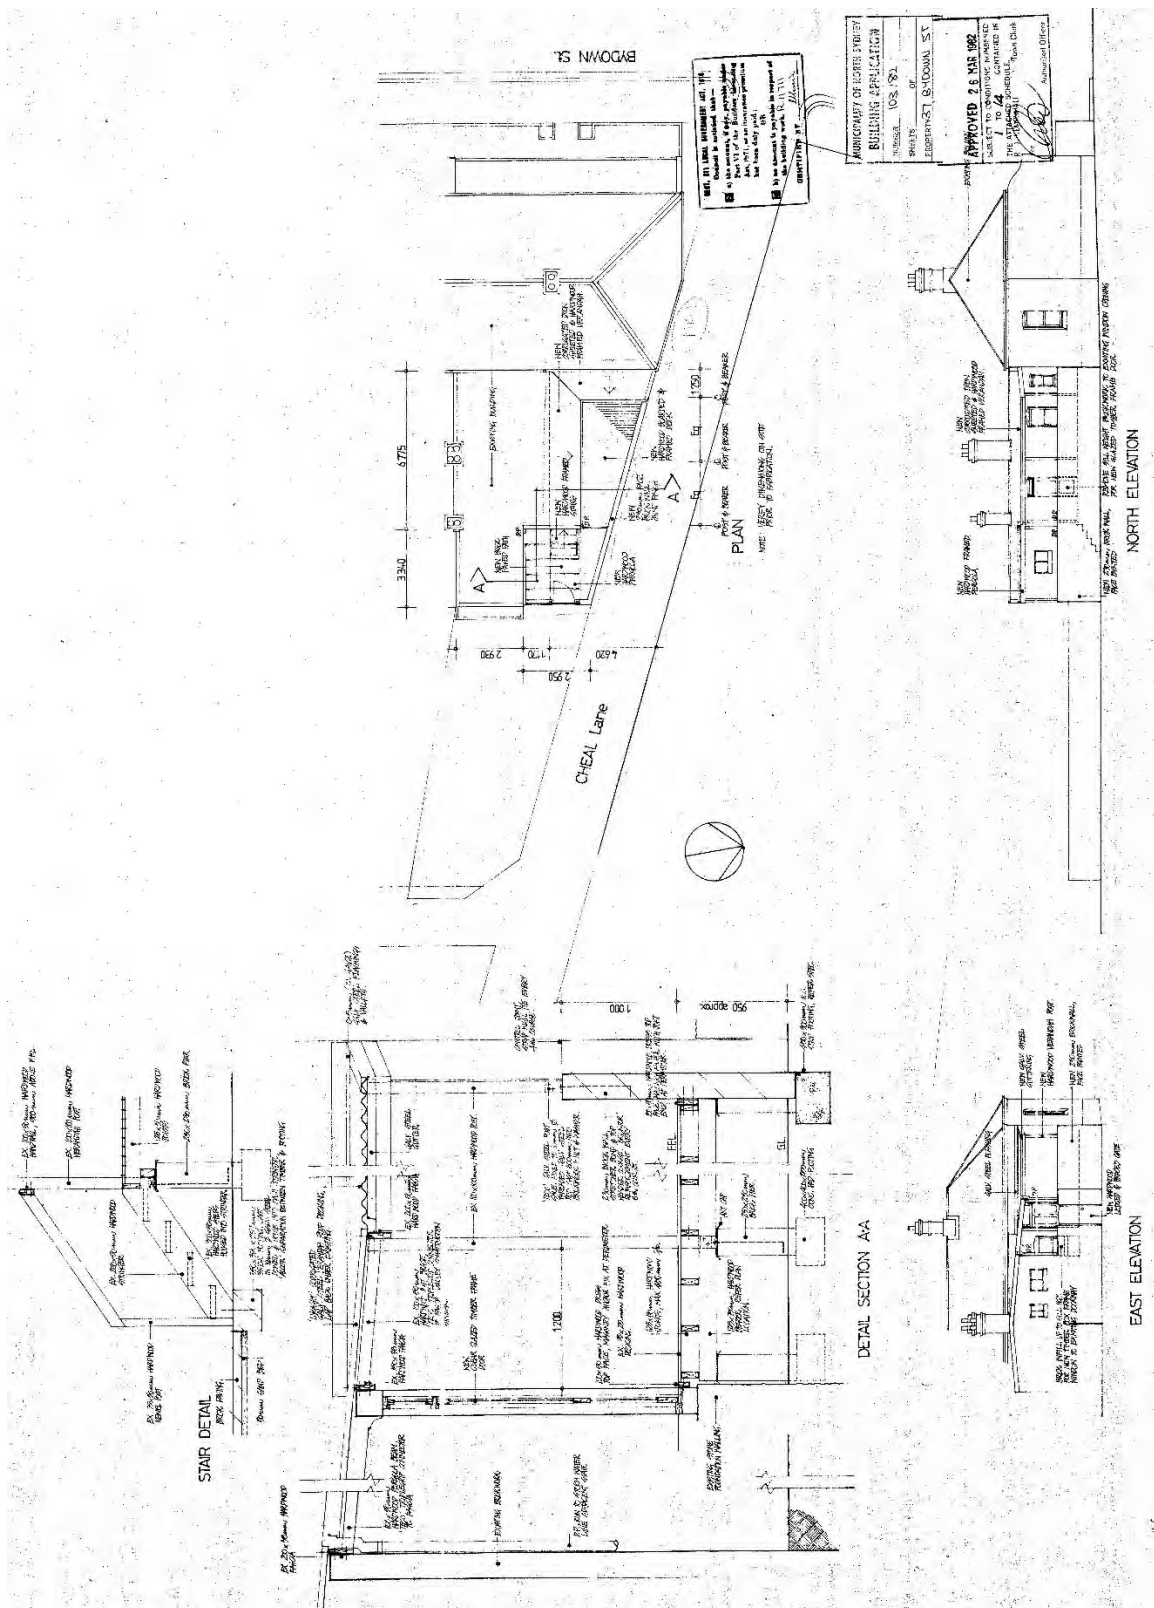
1982 plans for the addition of a rear verandah and boundary wall additions at verandah, deck and boundary wall additions for No. 37 Bydown Street. (BA No. 82/103) (Source: North Sydney Council Archives)
